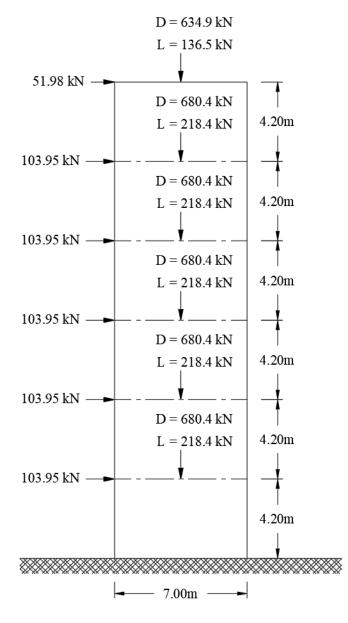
Reinforced Concrete Shear Wall Geometry and Loading
